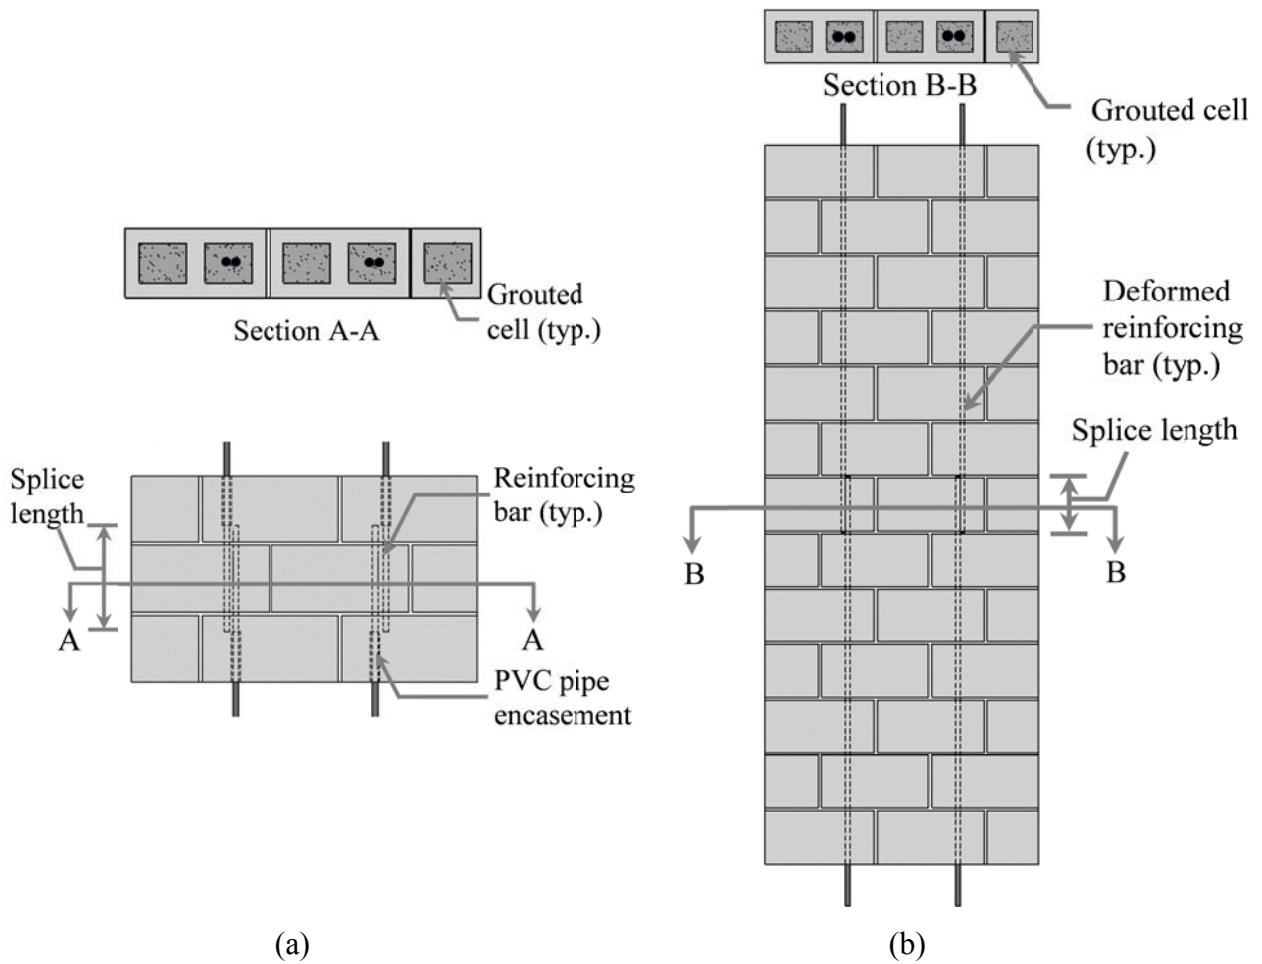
Contact Lap Splice Geometry (Ahmed & Feldman, 2012): (a) Double Pullout Specimen, and (b) Wall Splice Specimen.
